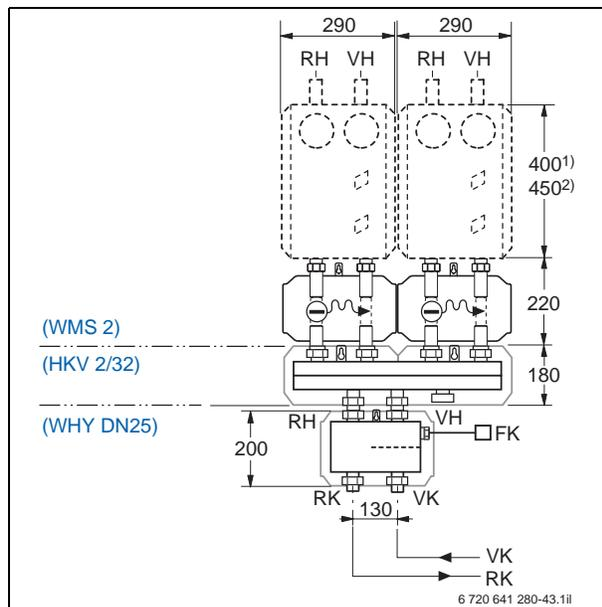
Dimensions of the heat meter set with heating circuit distributor (dim. in mm)
